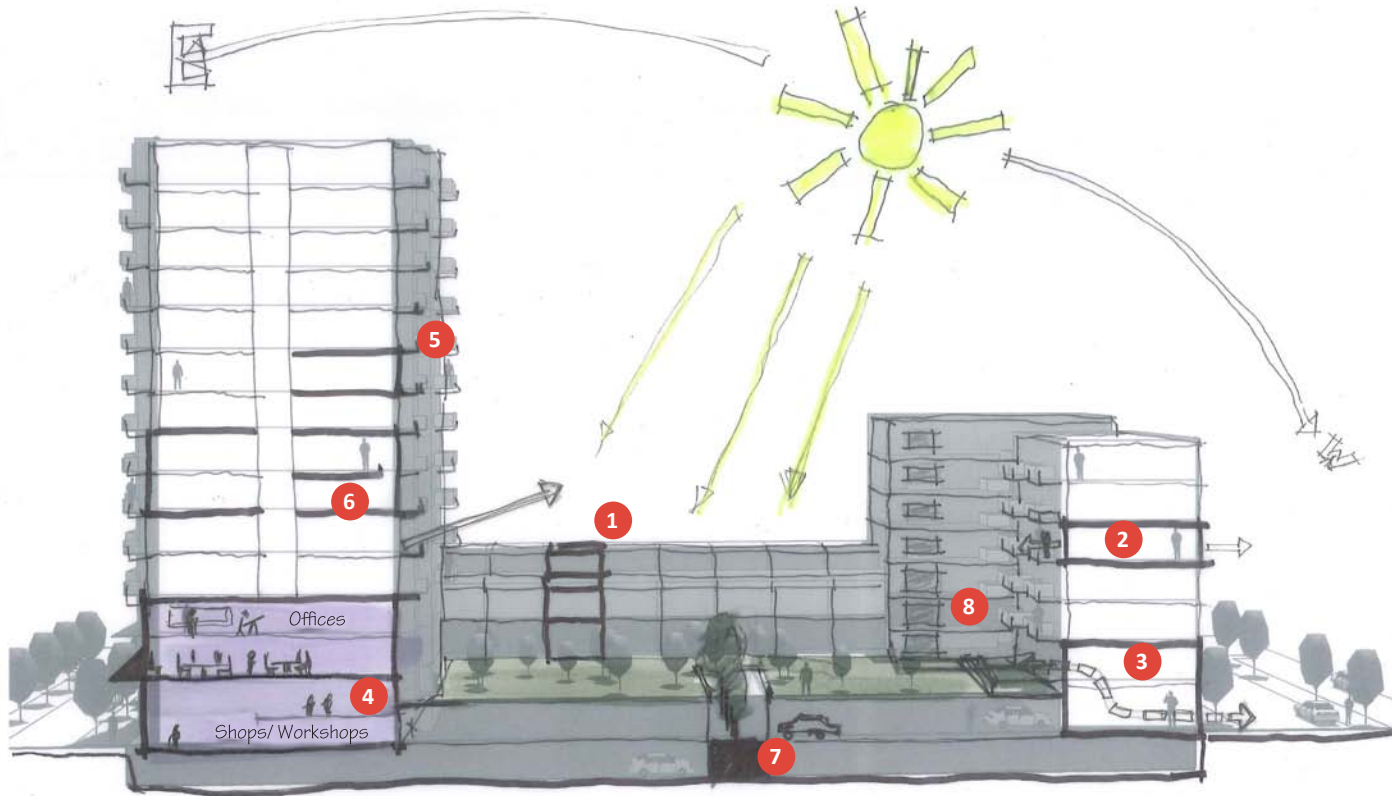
Indicative east-west section through city centre perimeter block with a tall building
